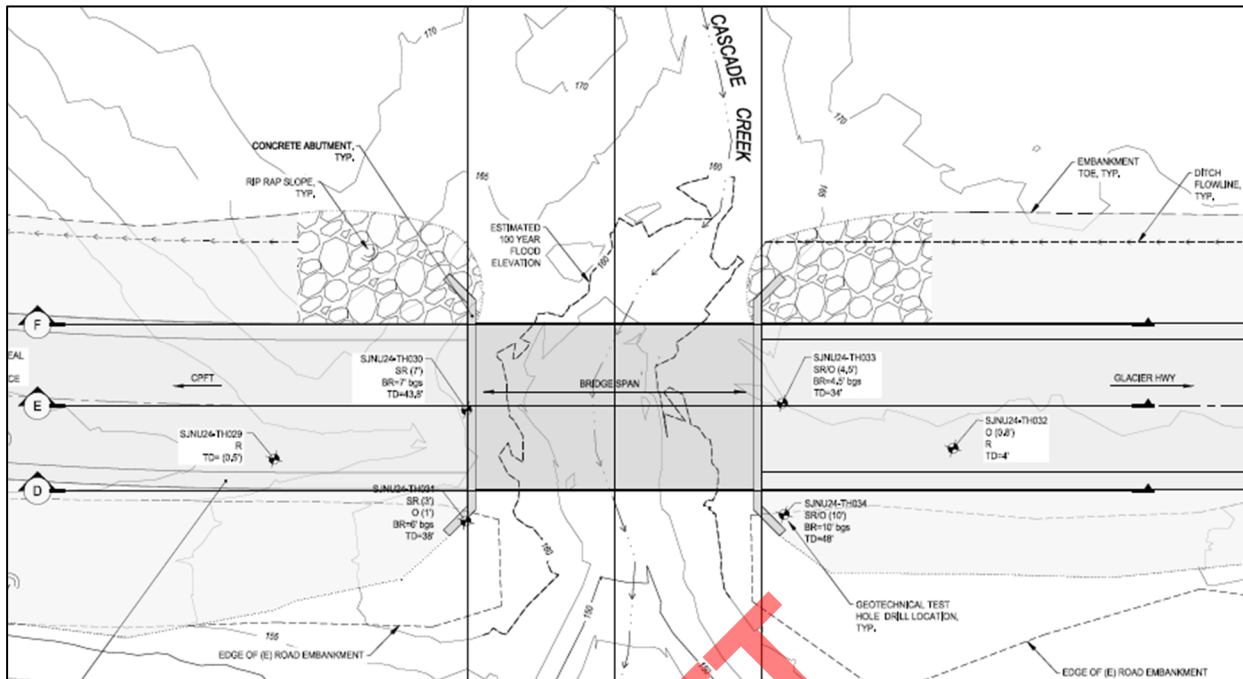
Plan view of the proposed bridge across Cascade Creek (PND, 2025).
